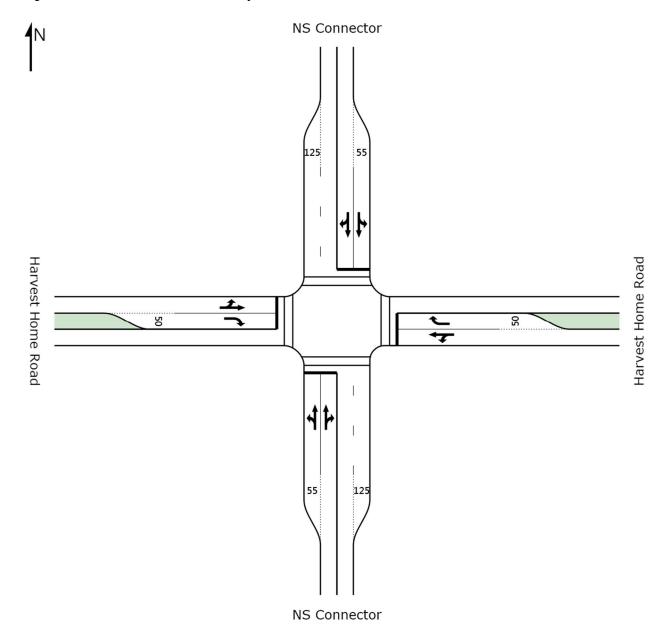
Intersection 2 recommended layout – North South Connector and local town centre access
